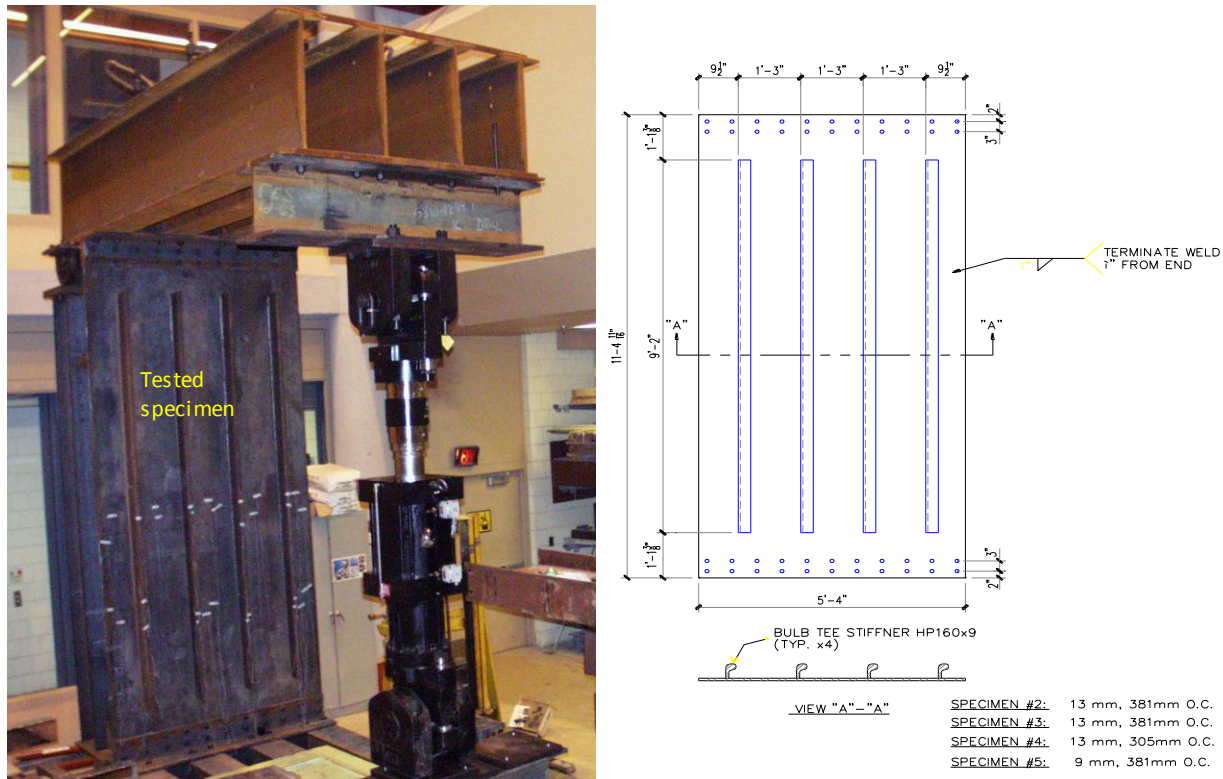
Axial tension test fixture (left) and typical cross section of stiffened single panels (right)
